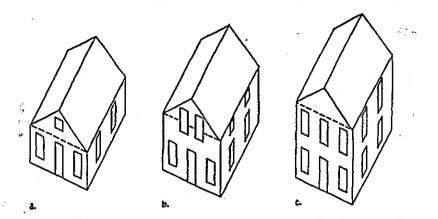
Wall height guidelines illustrated, note the eave line: a) one story, b) one-and-one-half story, c) two story (after Murphy).
